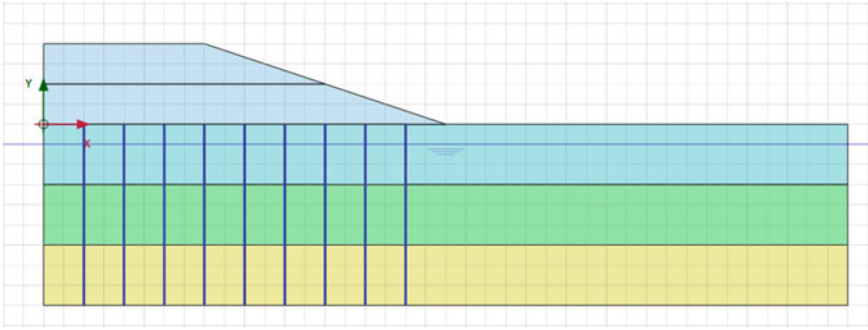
Geometrical modeling of an embankment resting on pile reinforced soft soil up to base depth
